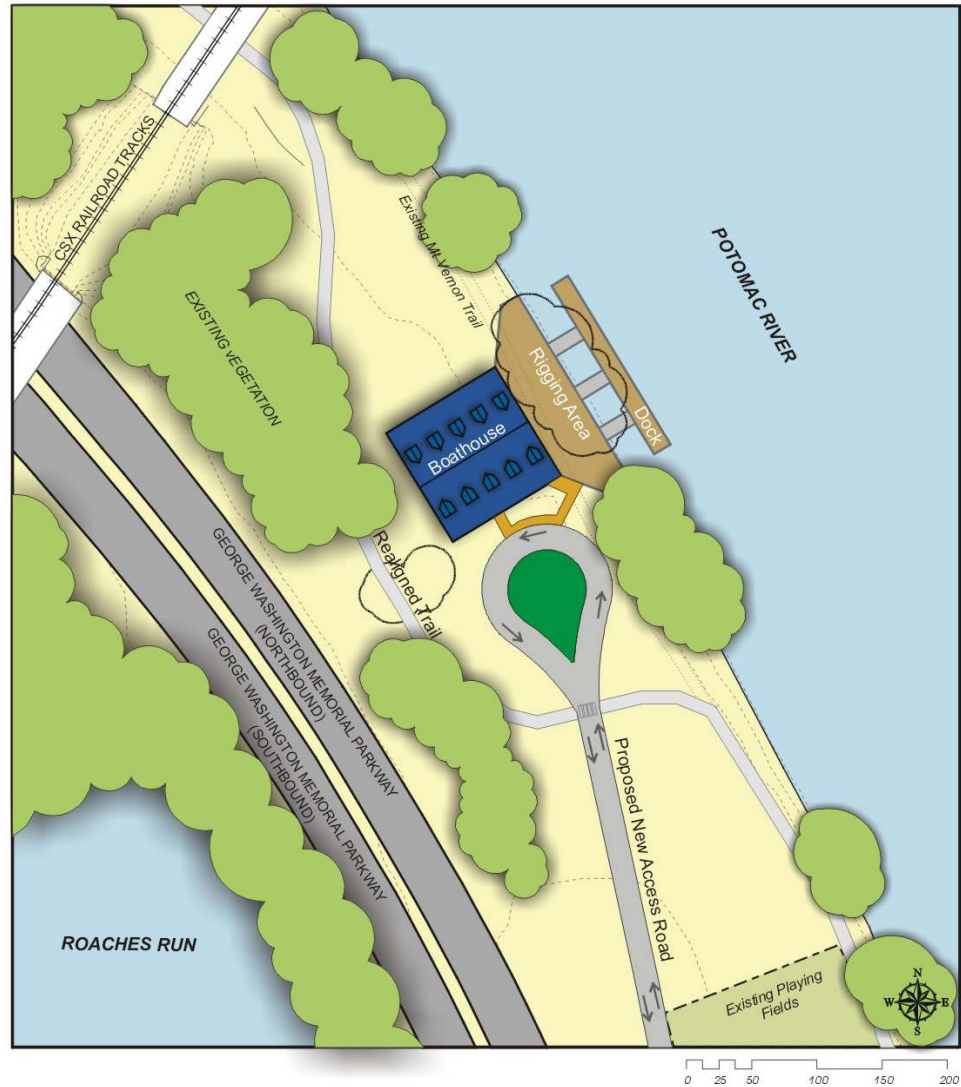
Enlarged Conceptual Site Plan, Minimum Program Boathouse
